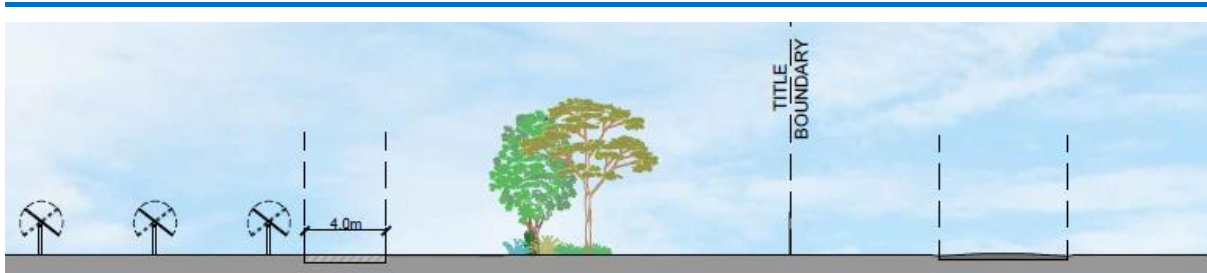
Cross section of proposed screen planting looking north along Hopkins Rd
